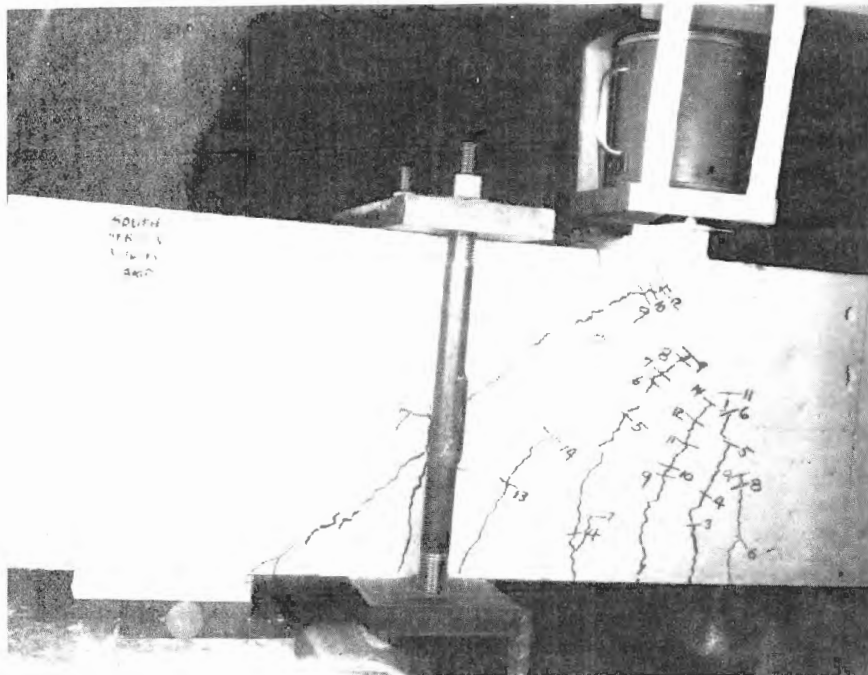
CLAMP USED ON ONE END OF THE BEAM TO PREVENT SHEAR FAILURE
